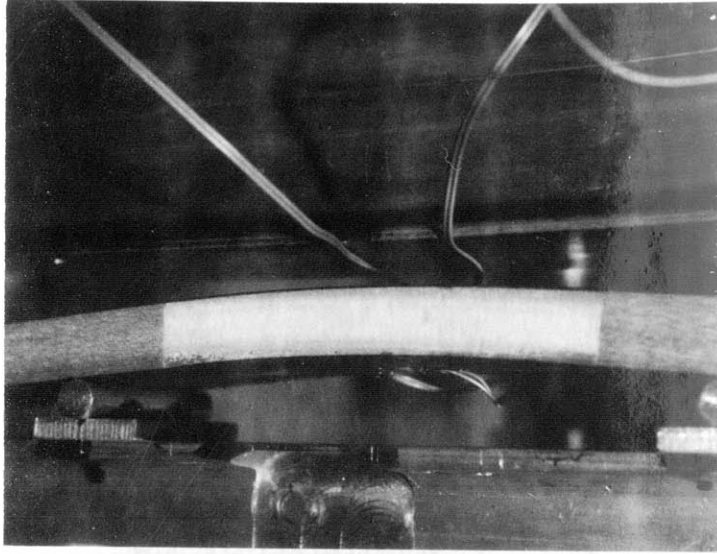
BEAM 5 BEING TESTED AT A LOAD OF 740 POUNDS
